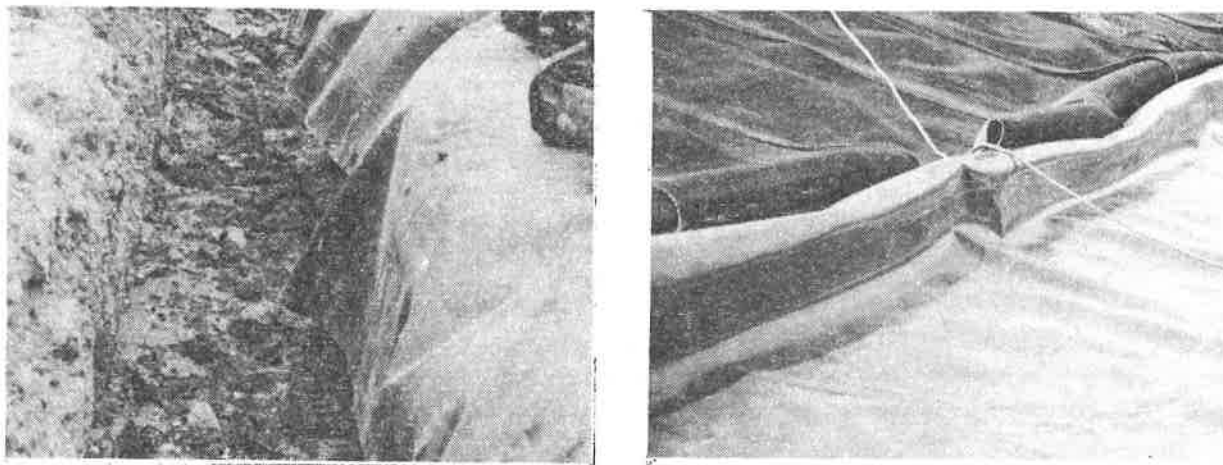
Liner slipped downslope causing shortage in anchor trench (left) and excessive wrinkle at toe (right).
